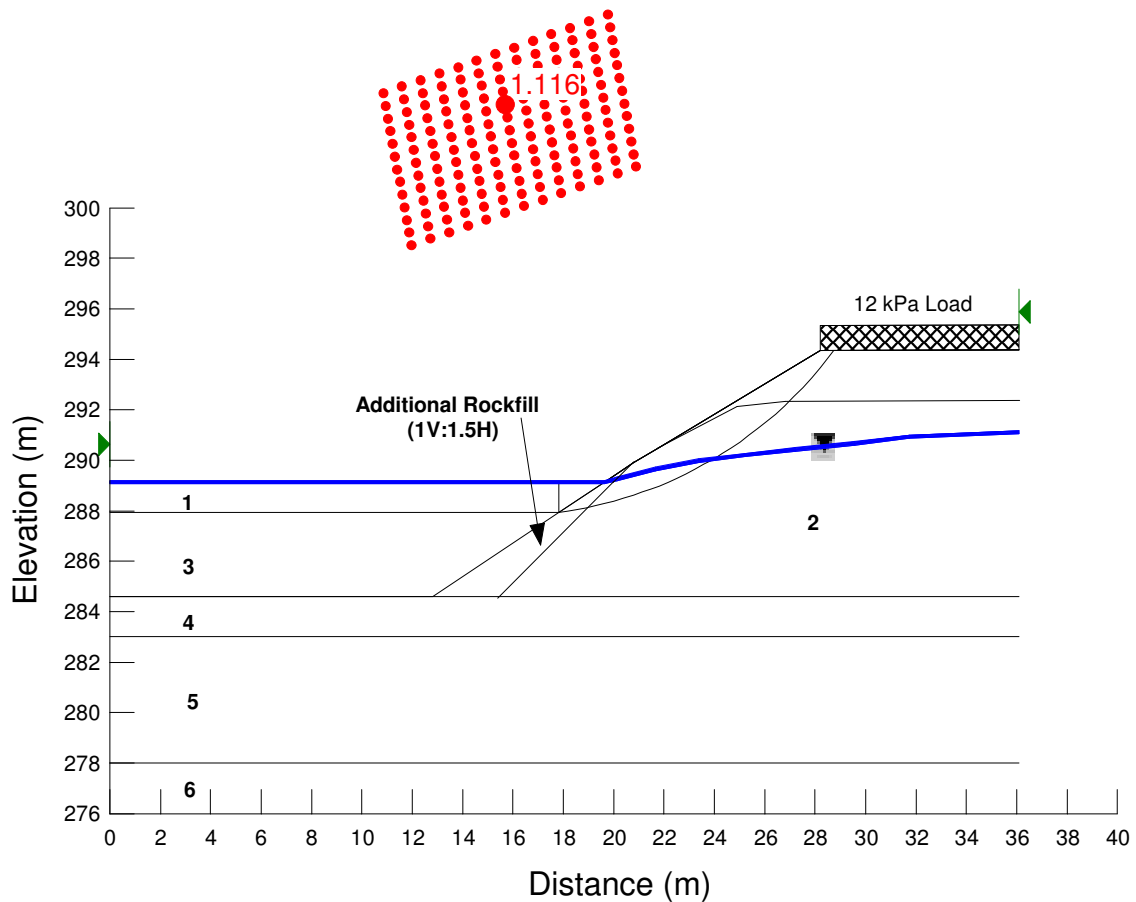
Stability of HWY11 Road Section at Sta. 14+900
